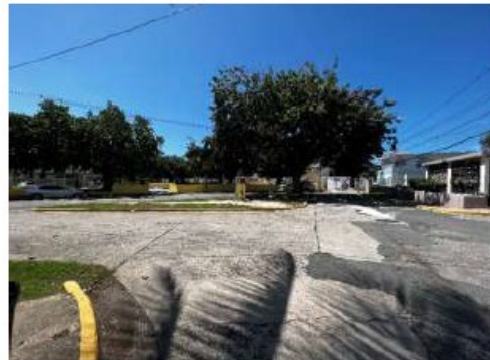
View of Plaza Entrance and Perimeter Sidewalk
